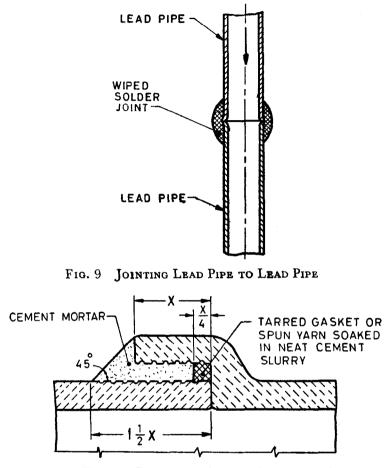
TYPICAL DETAILS OF CEMENT JOINTS FOR GLAZED STONEWARE PIPES
